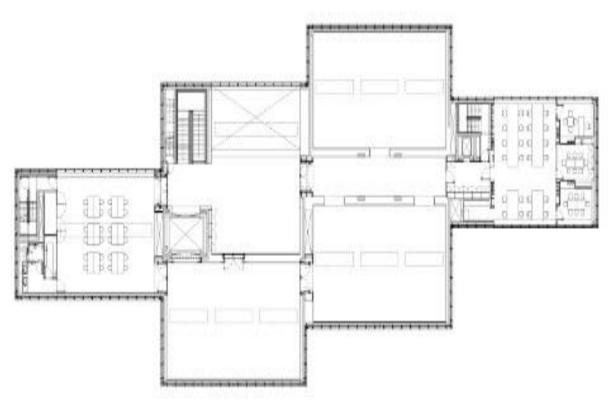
First Floor Plan Turner Contemporary Art Gallery
